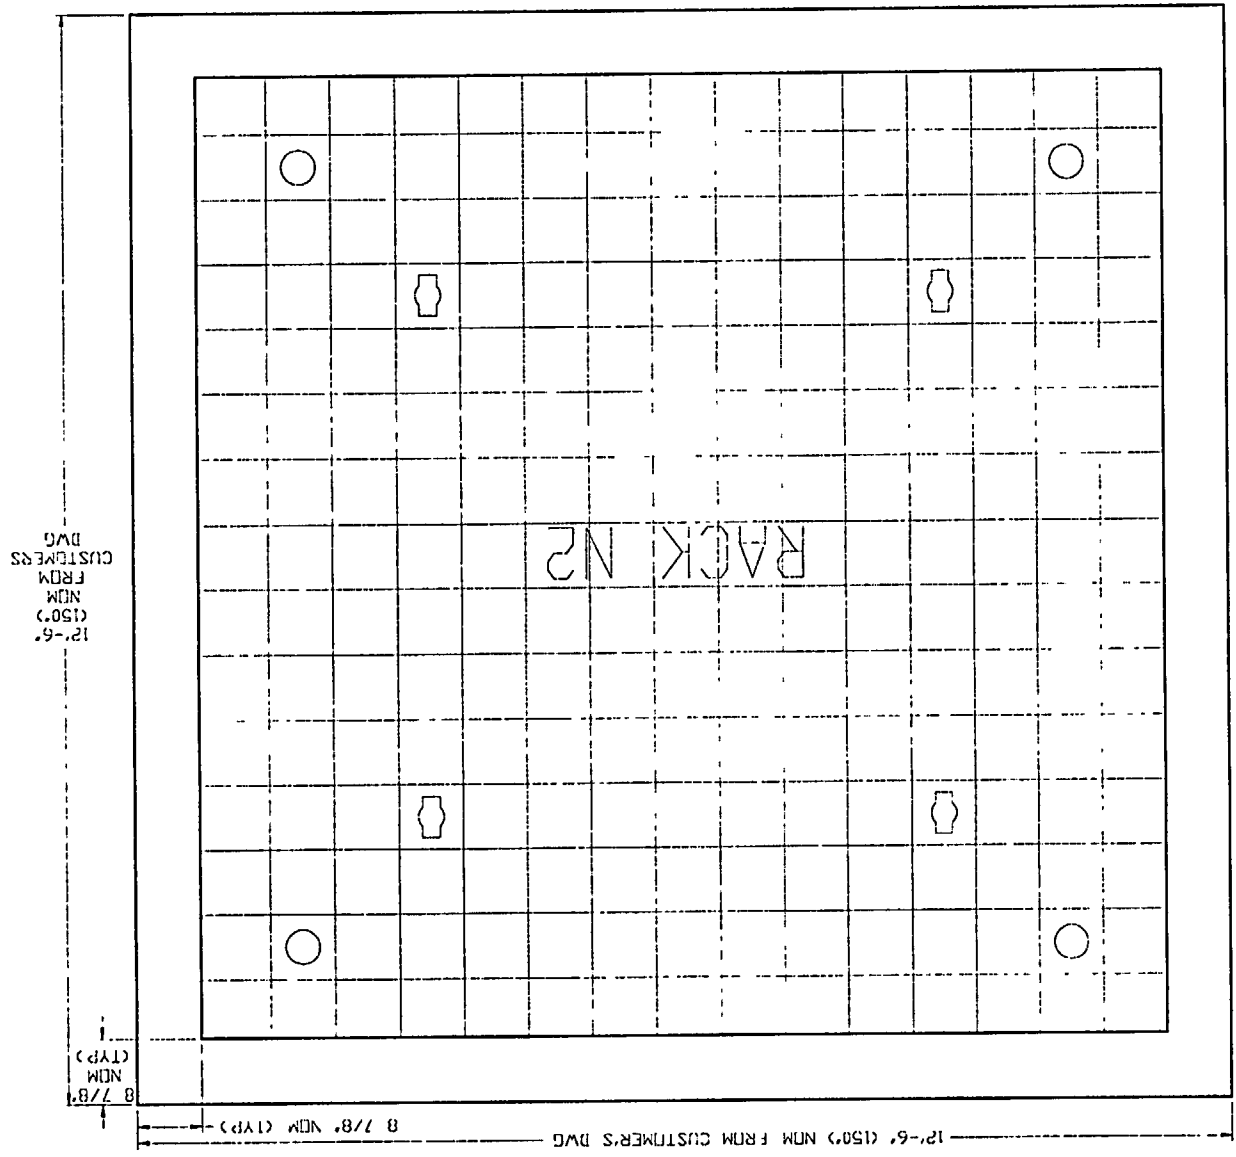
; UNIT 1 CASK PIT RACK LAYOUT
